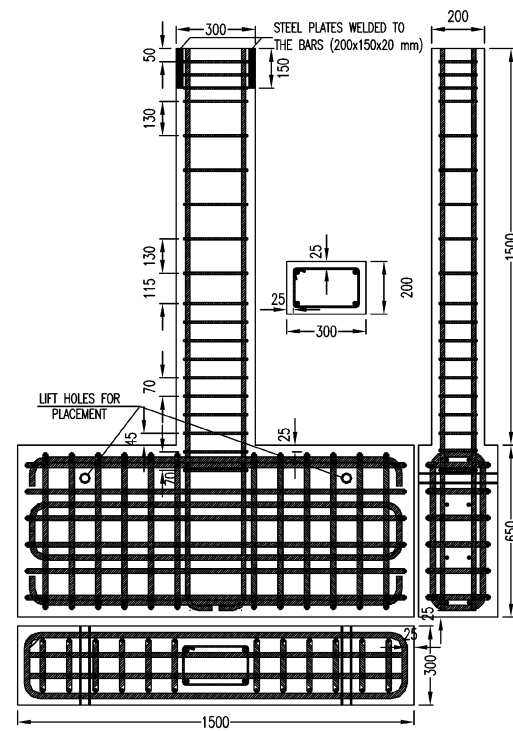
shows the steel reinforcement of the column and of the foundation. The steel reinforcement of the column consists of 4 Ø16 and stirrups Ø8 at 70 mm distance, inside the plastic hinge, made of AISI304.
